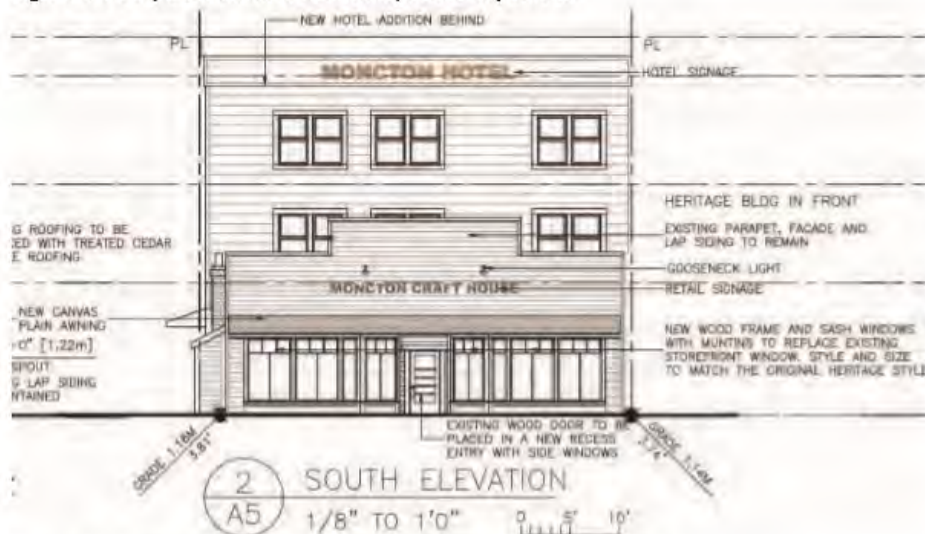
Proposed South Elevation, Ikeda Dry Goods and Hotel
